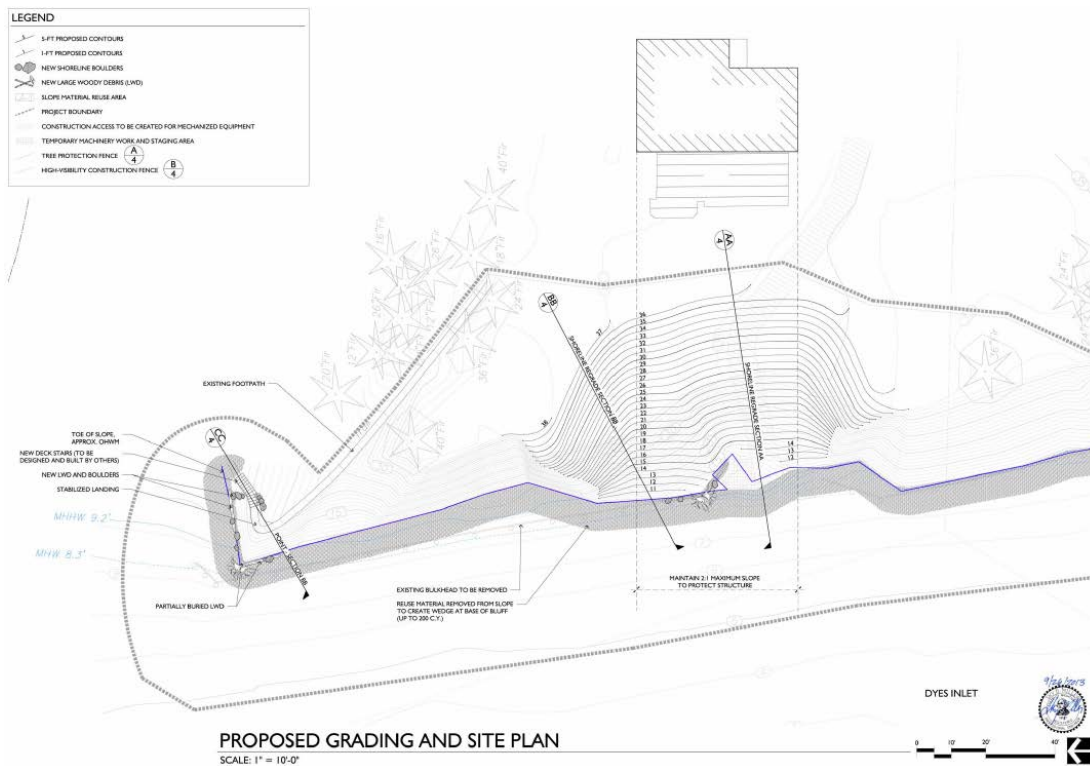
SITE PLAN SHOWING PROPOSED CONDITIONS WITH BULKHEAD REMOVAL, GRADING AND LARGE WOOD INSTALLATIONS.
